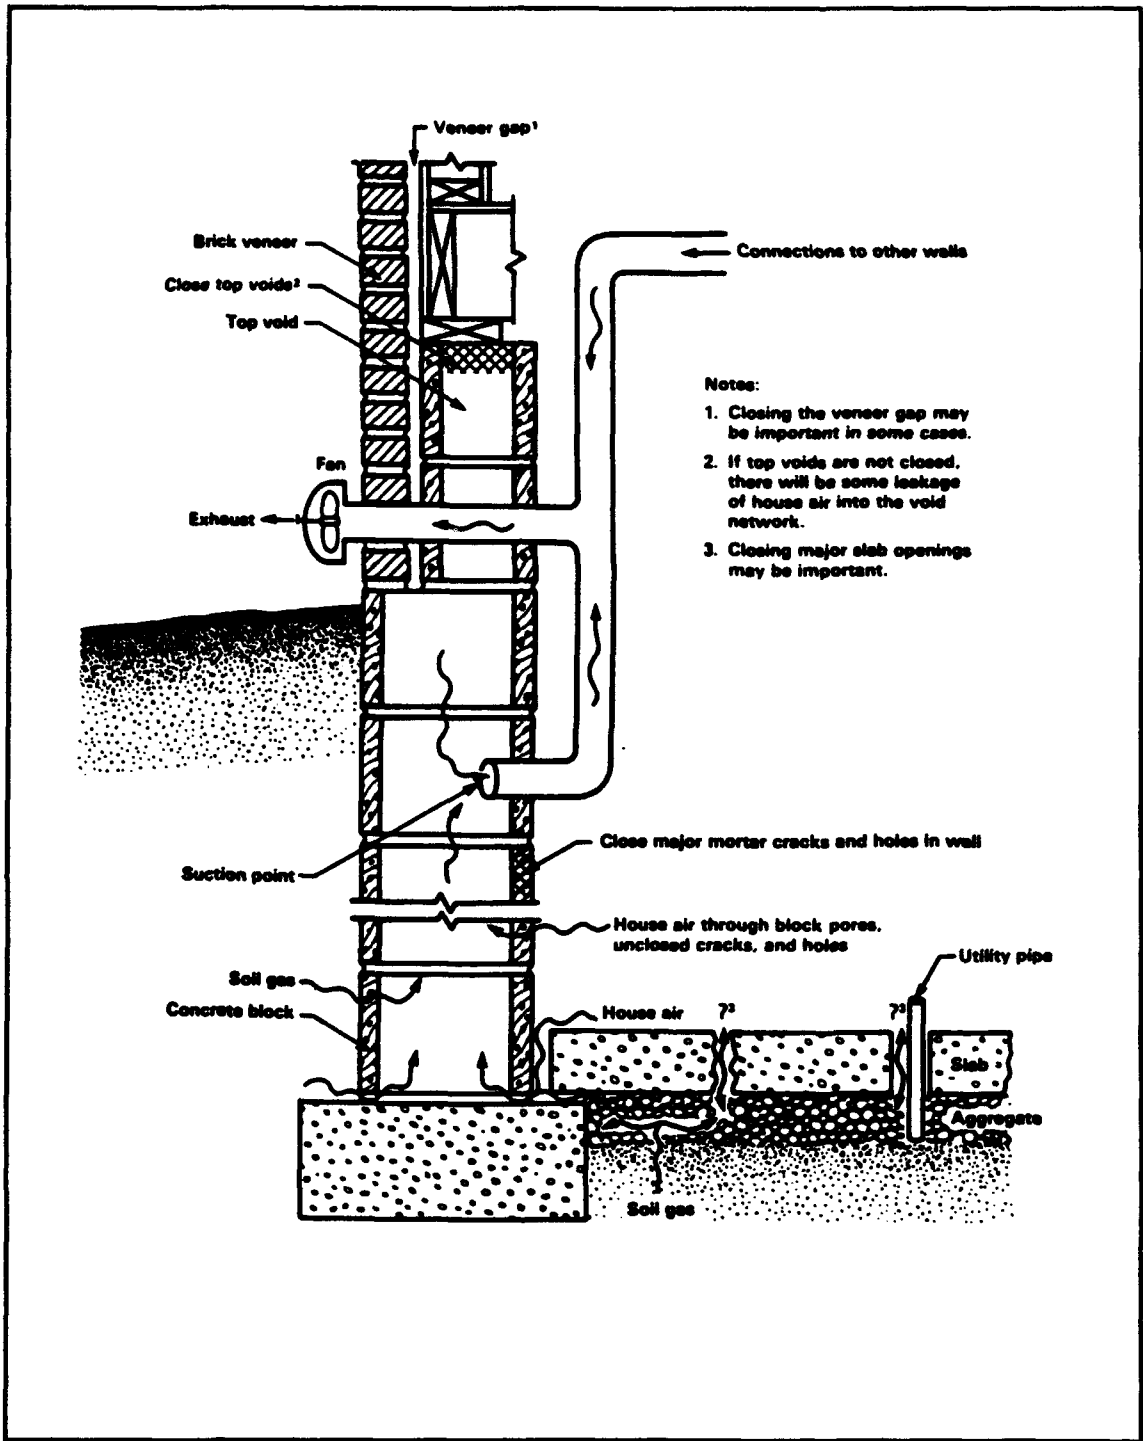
Wall Ventilation with Individual Suction Points in each Wall (Source: EPA 1986, p.23)
